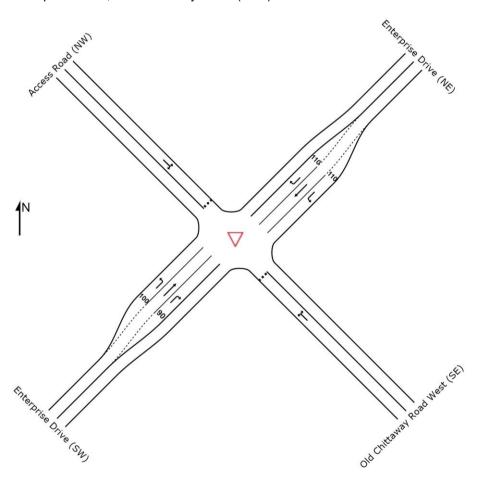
Future intersection layout – for Enterprise Drive, Old Chittaway Road (West) and Access Road modelled in SIDRA
